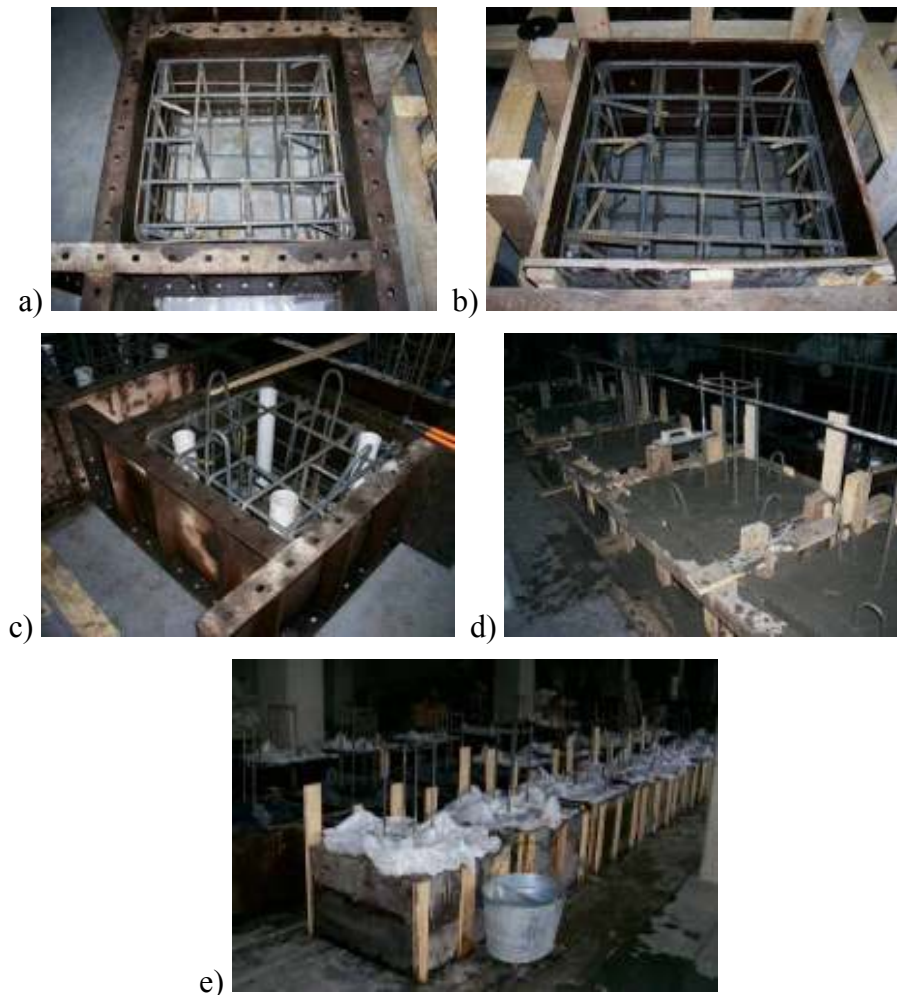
Views from preparation of footing: (a) Steel molds, (b) Wood molds, (c) Hooks and PVC pipes, (d) Placement of concrete to footing, (e) Curing application.
